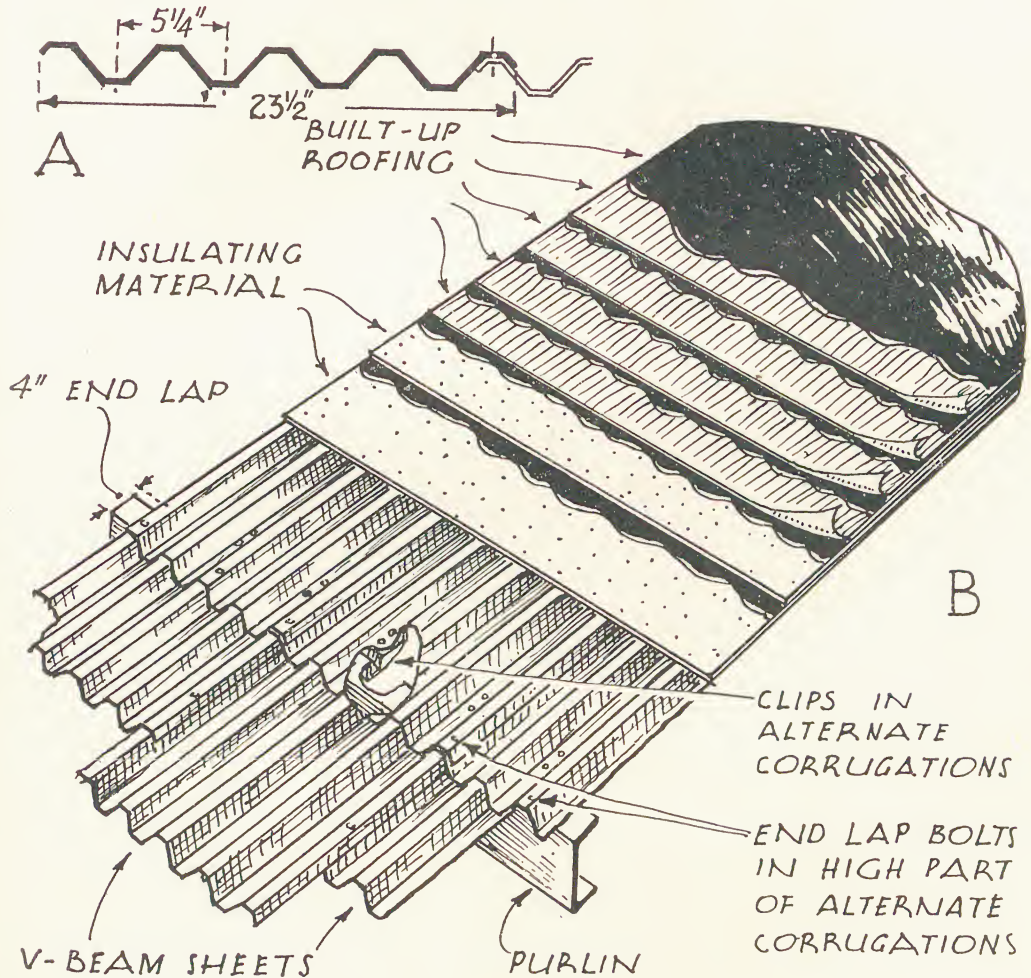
A, Section through V-beam protected metal sheet. B, Robertson V-beam roof decking.
